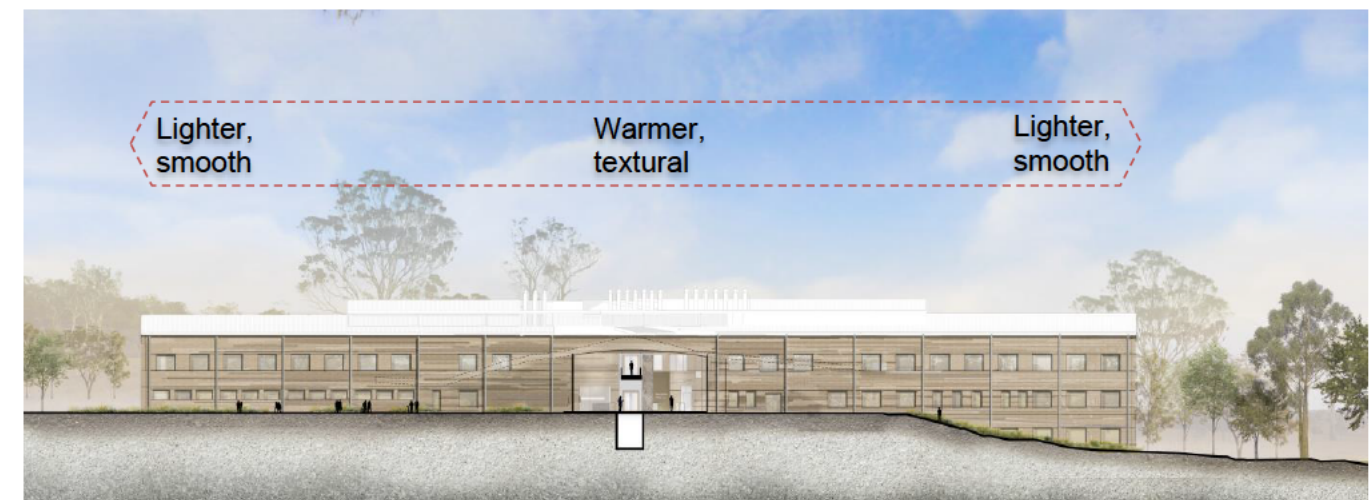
Elevation – Walawaani façade 'inner' skin – North elevation of southern wing
